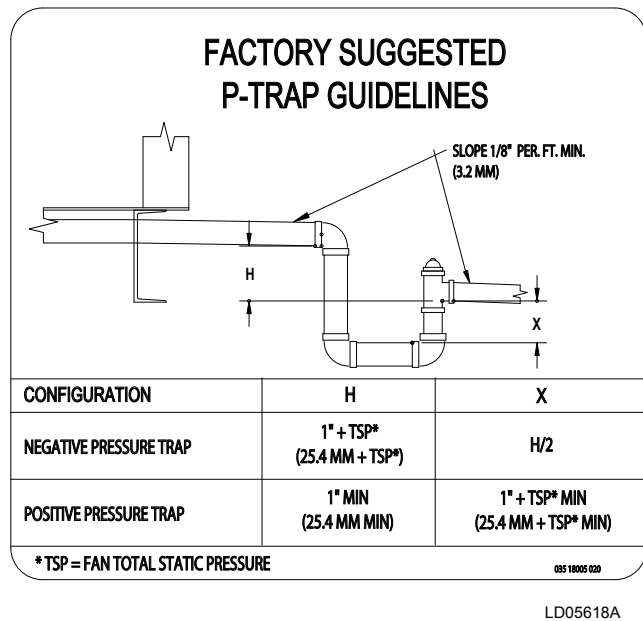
CONDENSATE DRAIN TRAP SIZING
